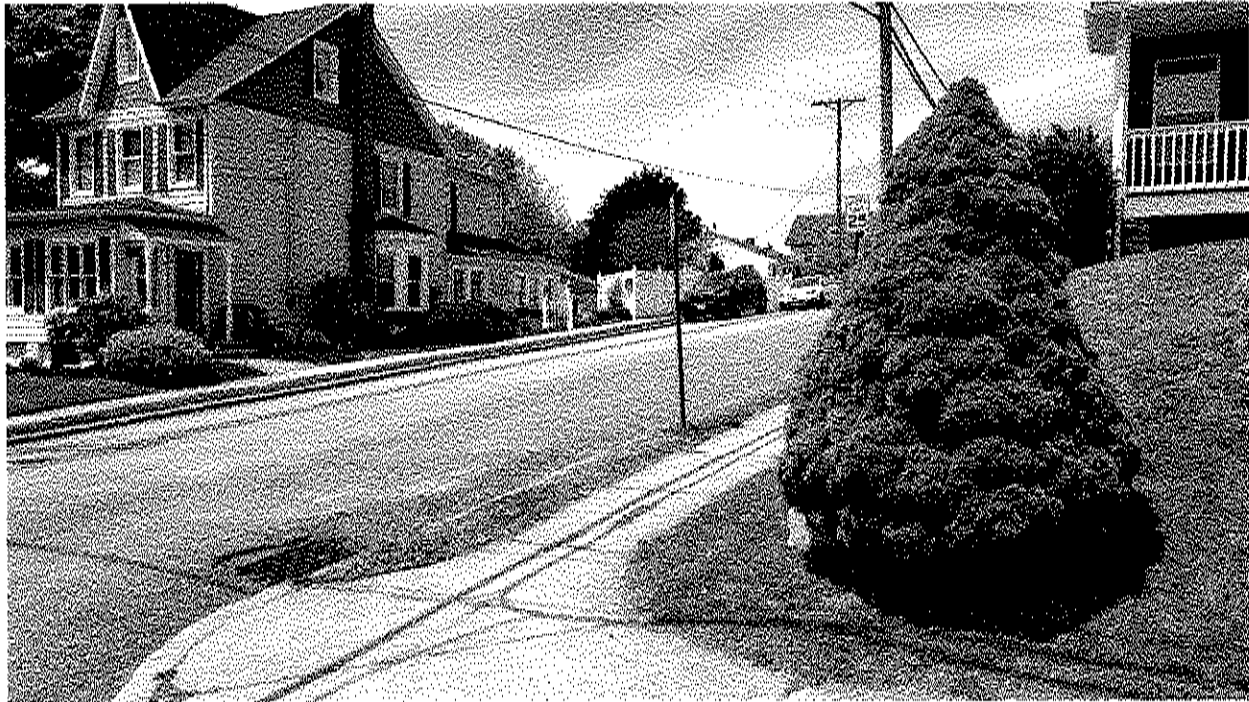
View from Pursel Street at intersection Wilbur Street looking right towards Center Street
